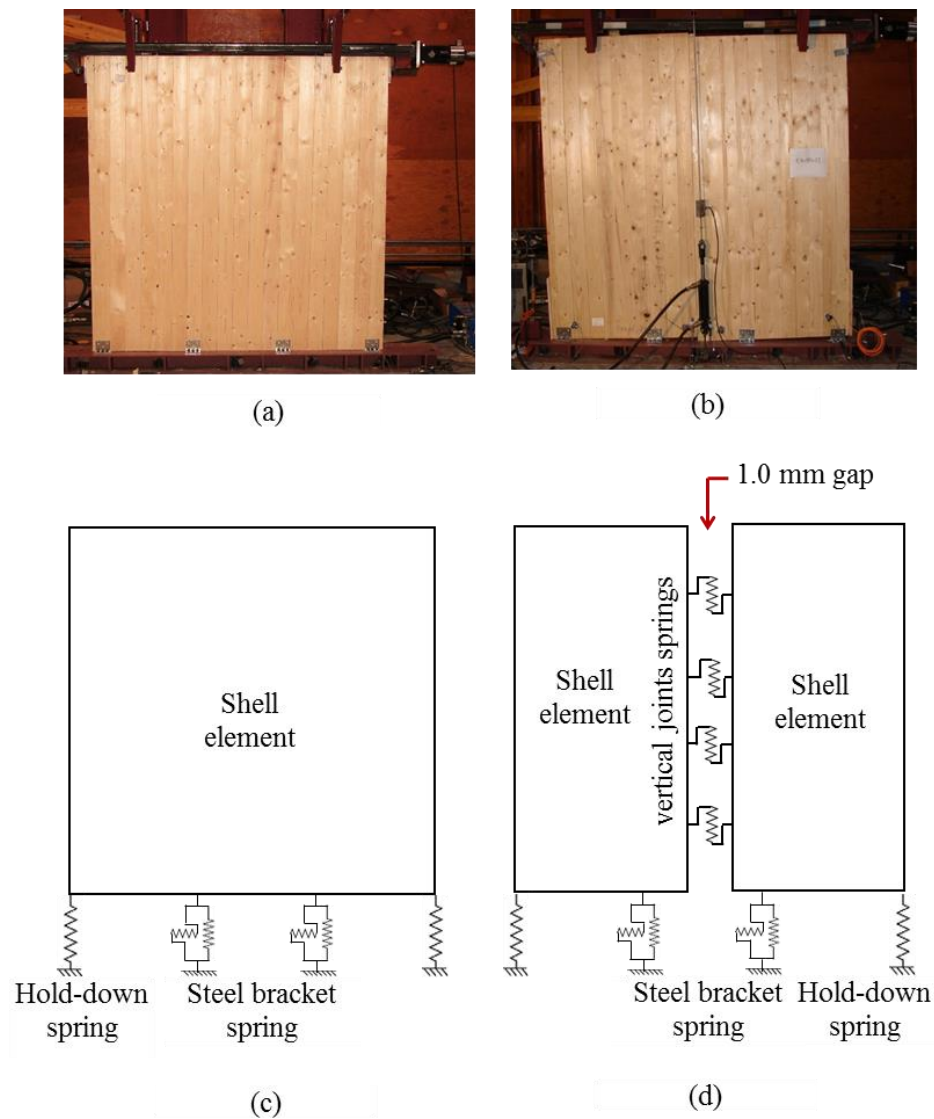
CLT shear wall's test setup: (a) single wall and (b) coupled wall; and Schematic of FE models: (c) single wall and (d) coupled wall
